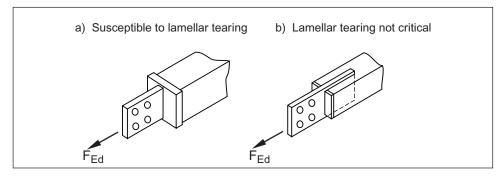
Splice joint. Design practices to reduce the risk for lamellar tearing
